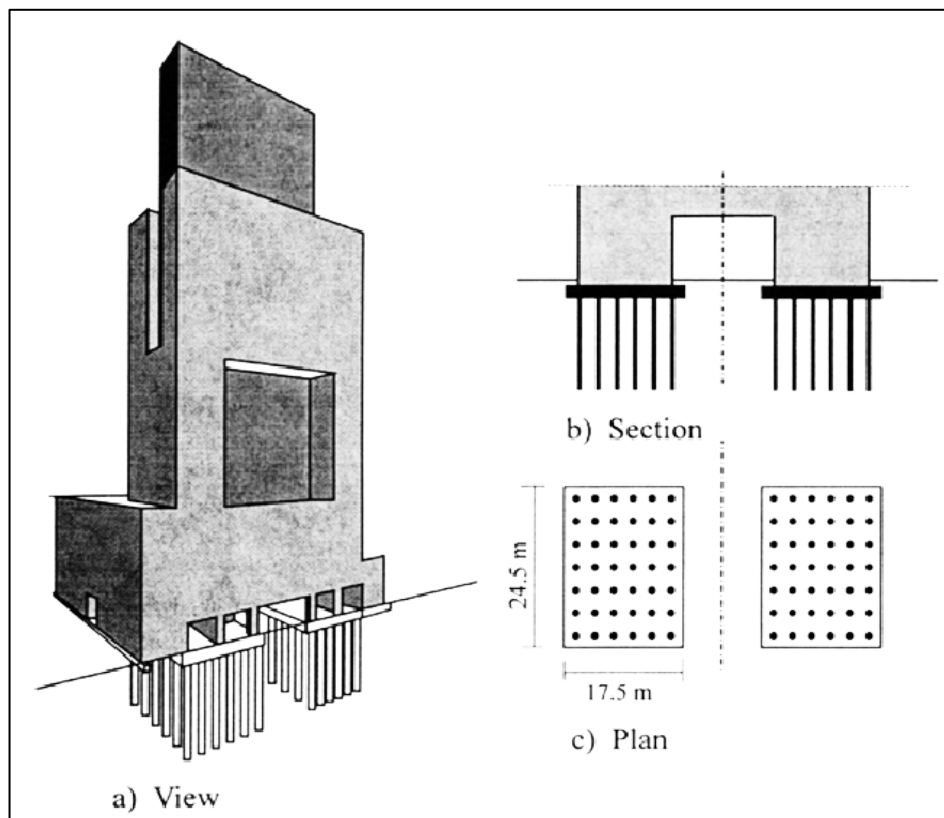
a) Elevation b) Section c) Plan view of Messe-Torhaus Building (El Mossallamy, 2002)
